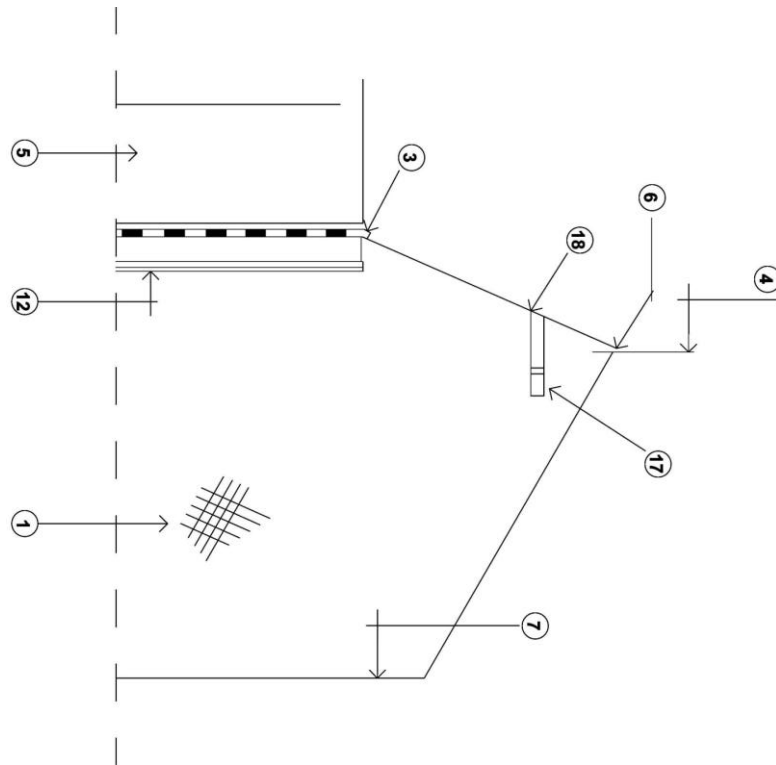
Typical Earth Foundation with (R.C.R.W)
